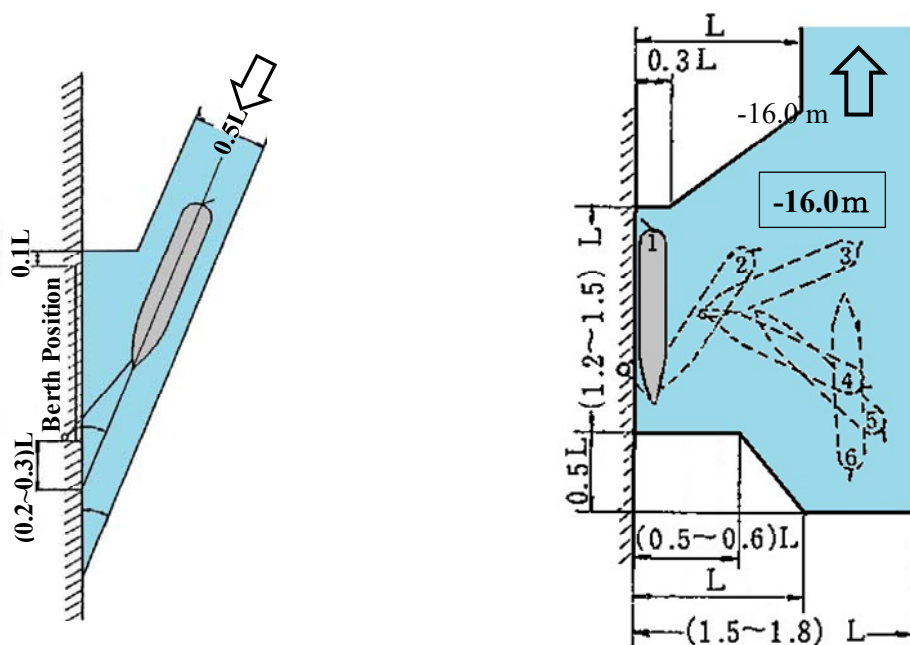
General Layout Plan of Mooring Facilities and Water Area
